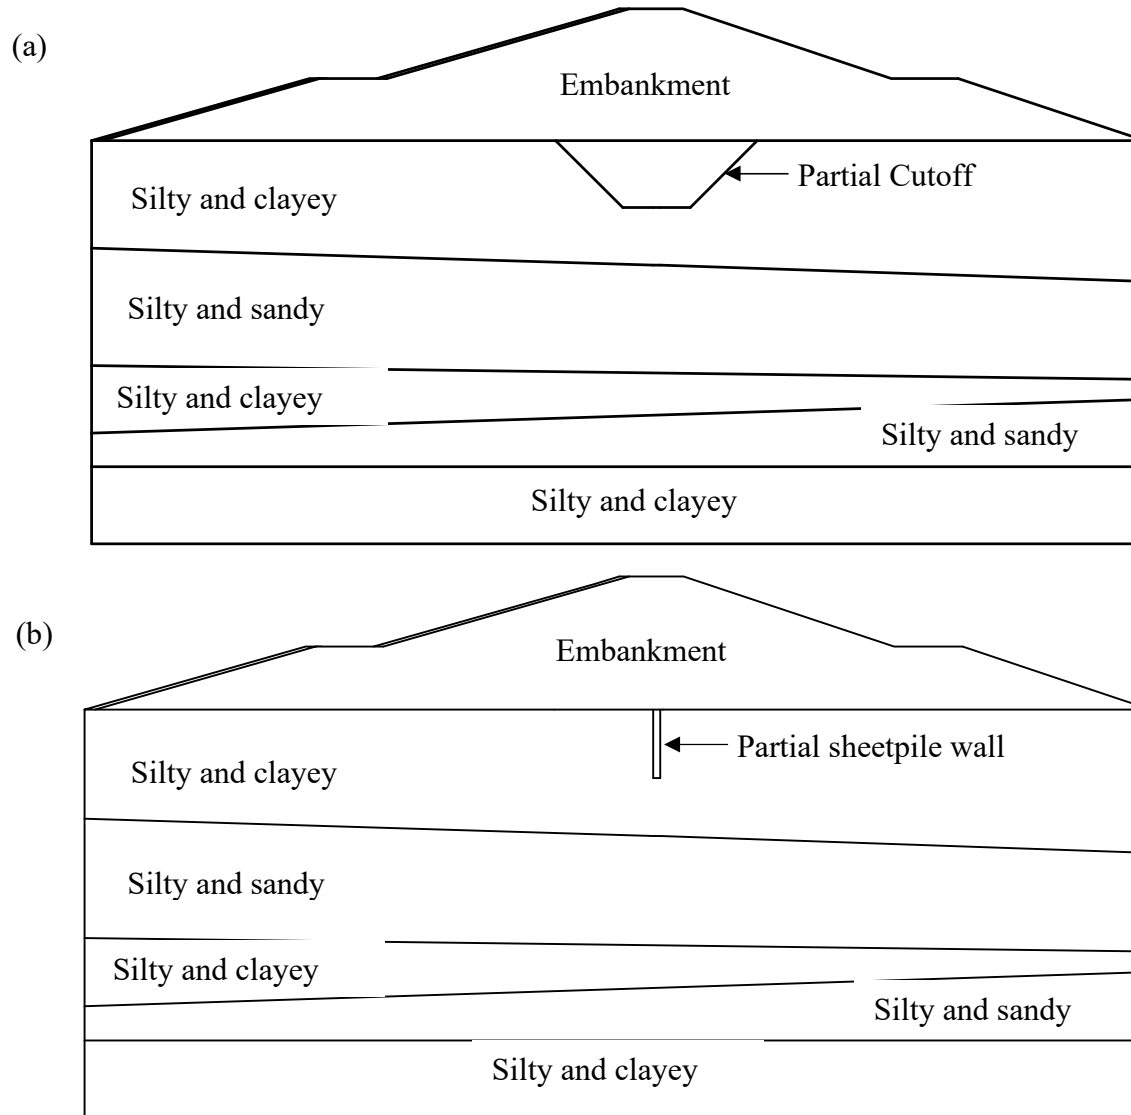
Cutoff Trench with Sheet Pile Wall Foundation Modification: (a) Partial Cutoff Trench and (b) Partial Sheetpile Wall
